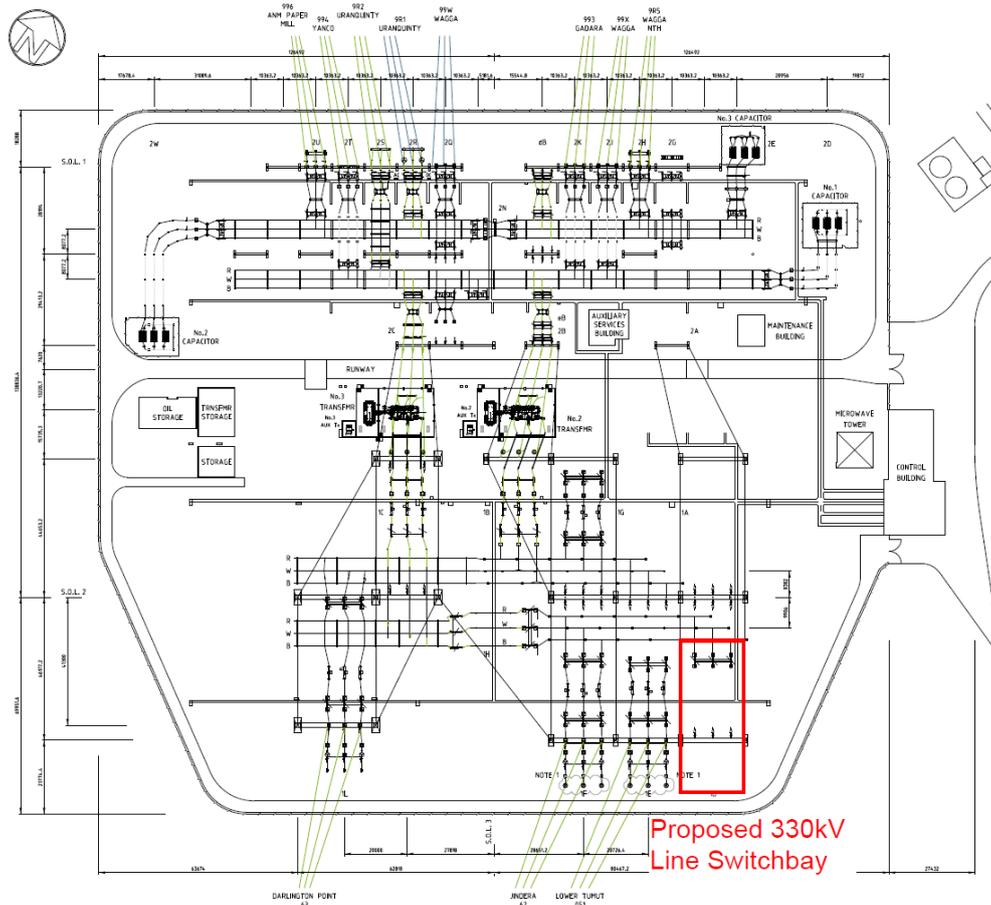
d – Proposed Wagga 330 Substation General Arrangement
